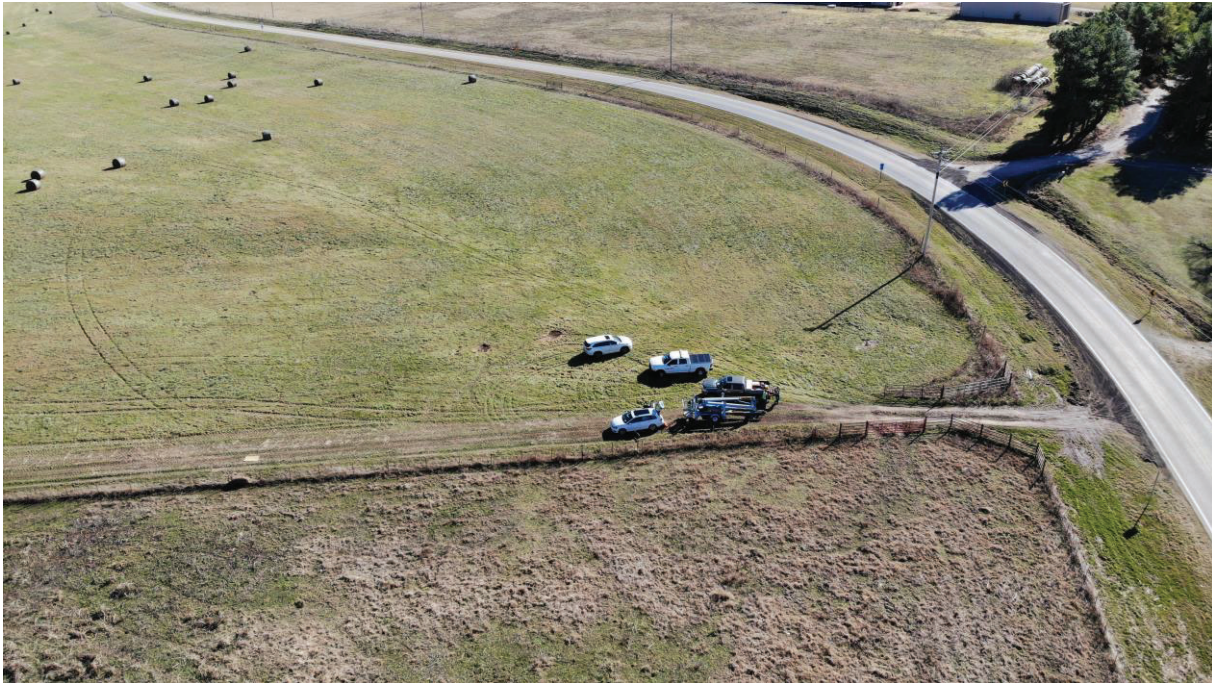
LiDAR and GNSS Setup at Lincoln Bridge 2 (West) (Job 040866)
